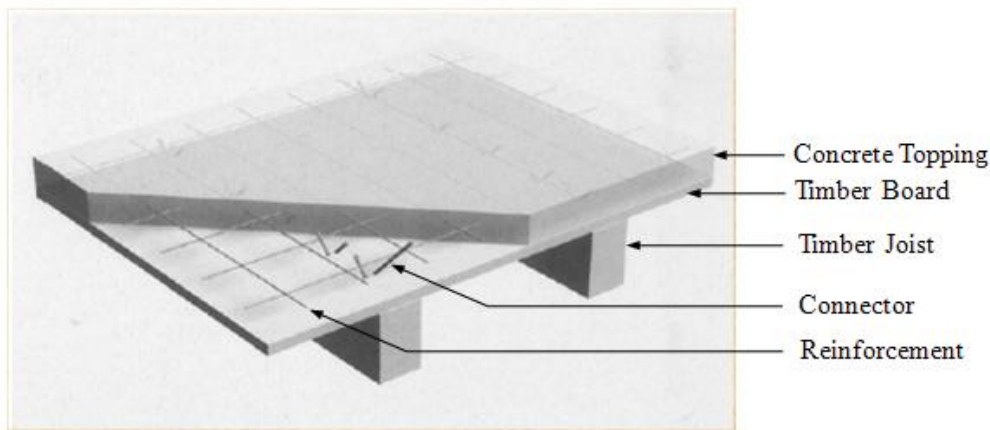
Typical TCC flooring system (Kolb 2008).
